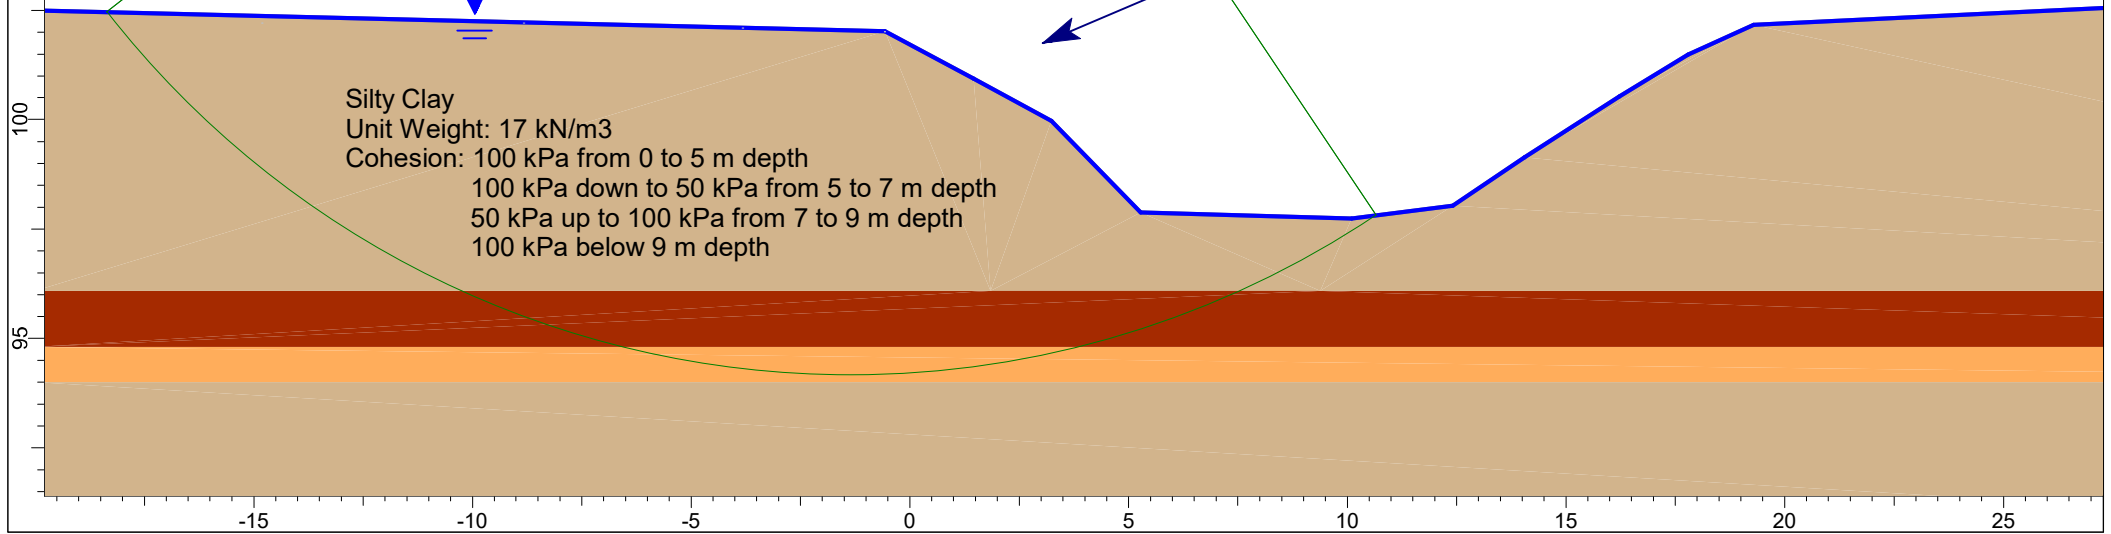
Section I - West - Proposed Conditions - Static Analysis
